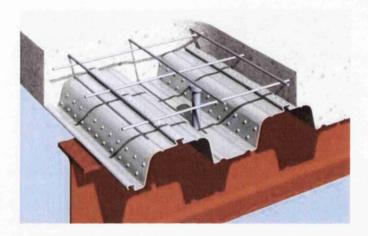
Comflor 80 deck working compositely with the concrete slab and steel beam (CP&P, 2002)
